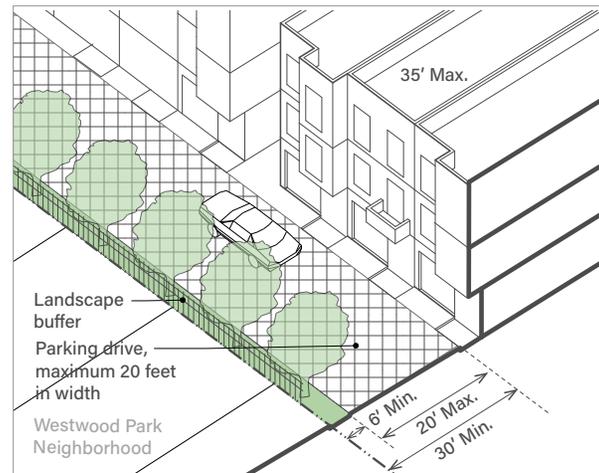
Private Drive Adjacent to Western Project Boundary
